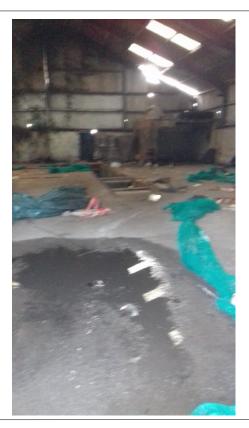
Possible inspection pit in floor of disused warehouse at Milforge Site.
